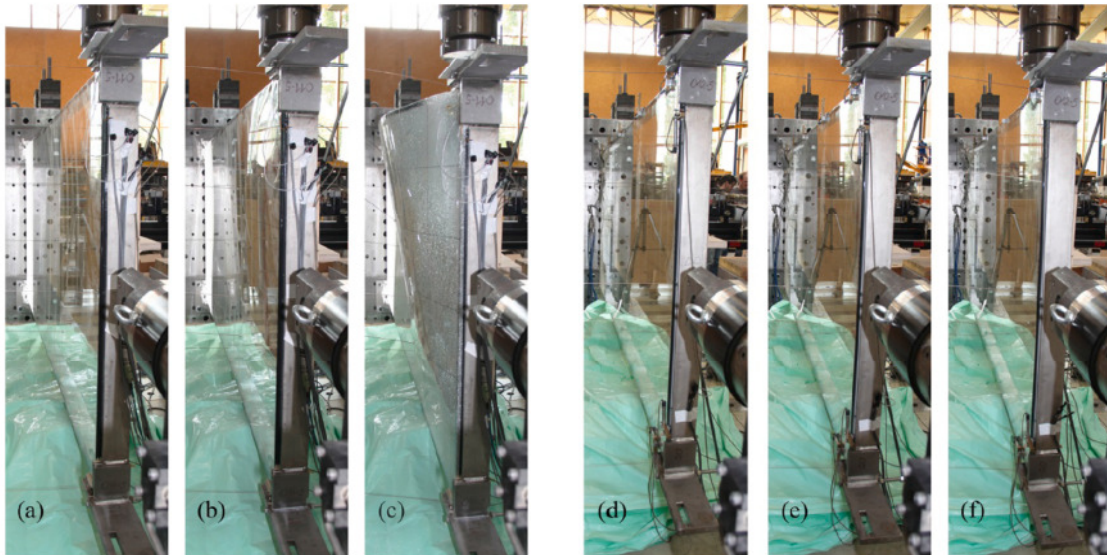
Different stages of testing for specimen Type 1B – (a) before loading, (b) shortly before failure and (c) after failure – and for specimen Type 2B – (d) before loading, (e) shortly before failure and (f) after failure.
